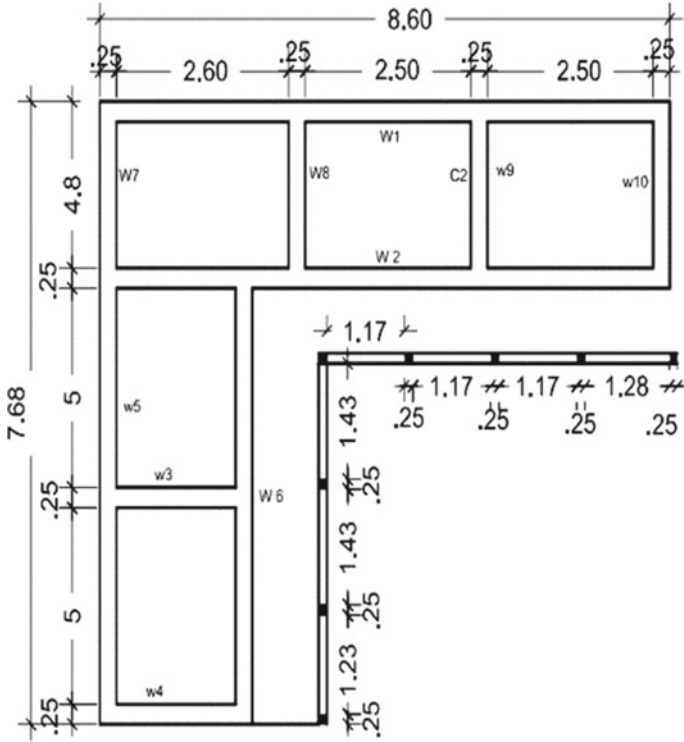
Plan of first floor of L-shape Building on a scale of 1:200
